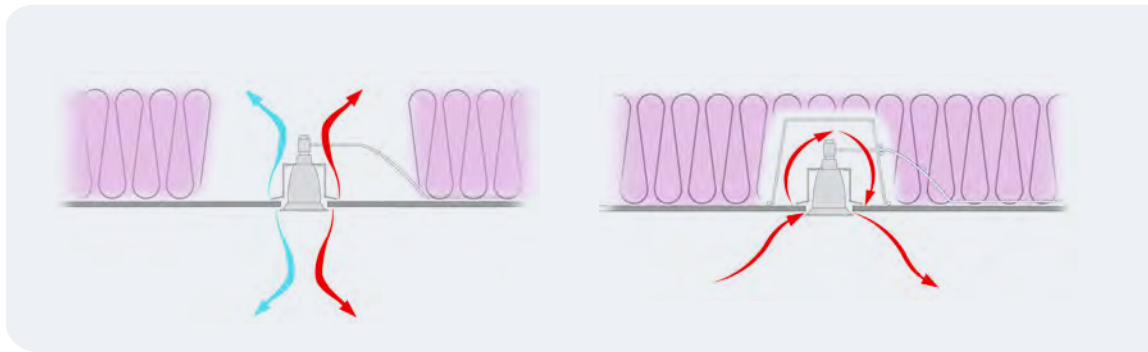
Seal downlights. Beware unwanted air movement through vented downlights.
